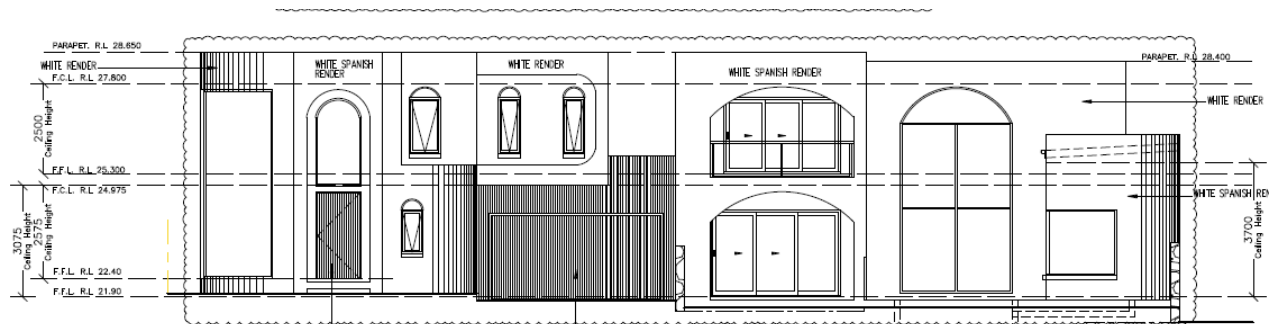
Proposed Eastern Elevation (Inkon Plans)
